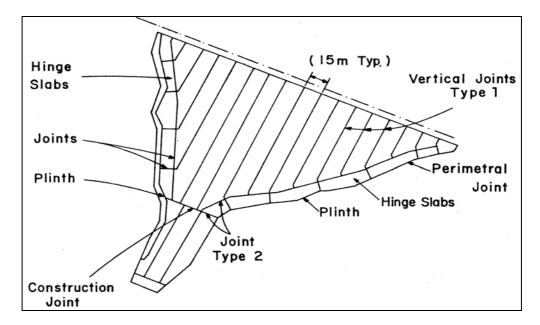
Face slab layout of Alto Anchicaya Dam (Materon, 1985).
